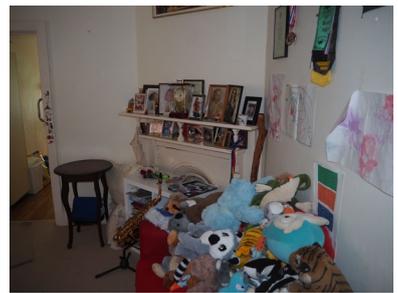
89: Original fireplace with hearth boarded over in living room.
